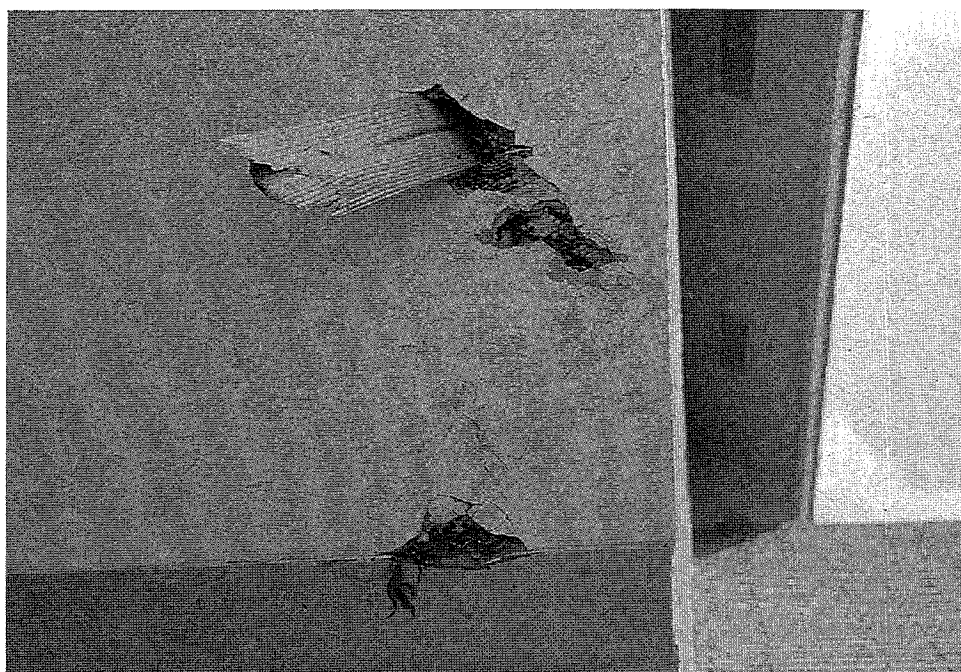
An example of projectile damage—a 1x fence board pierces the stucco finish and sheathing on a wood-framed wall.
